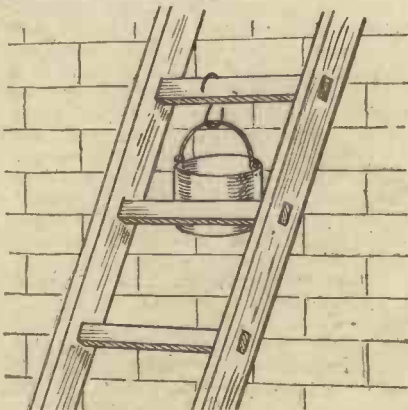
It is a good plan to hang the paint can on a meat hook placed over one of the rungs of the ladder.
